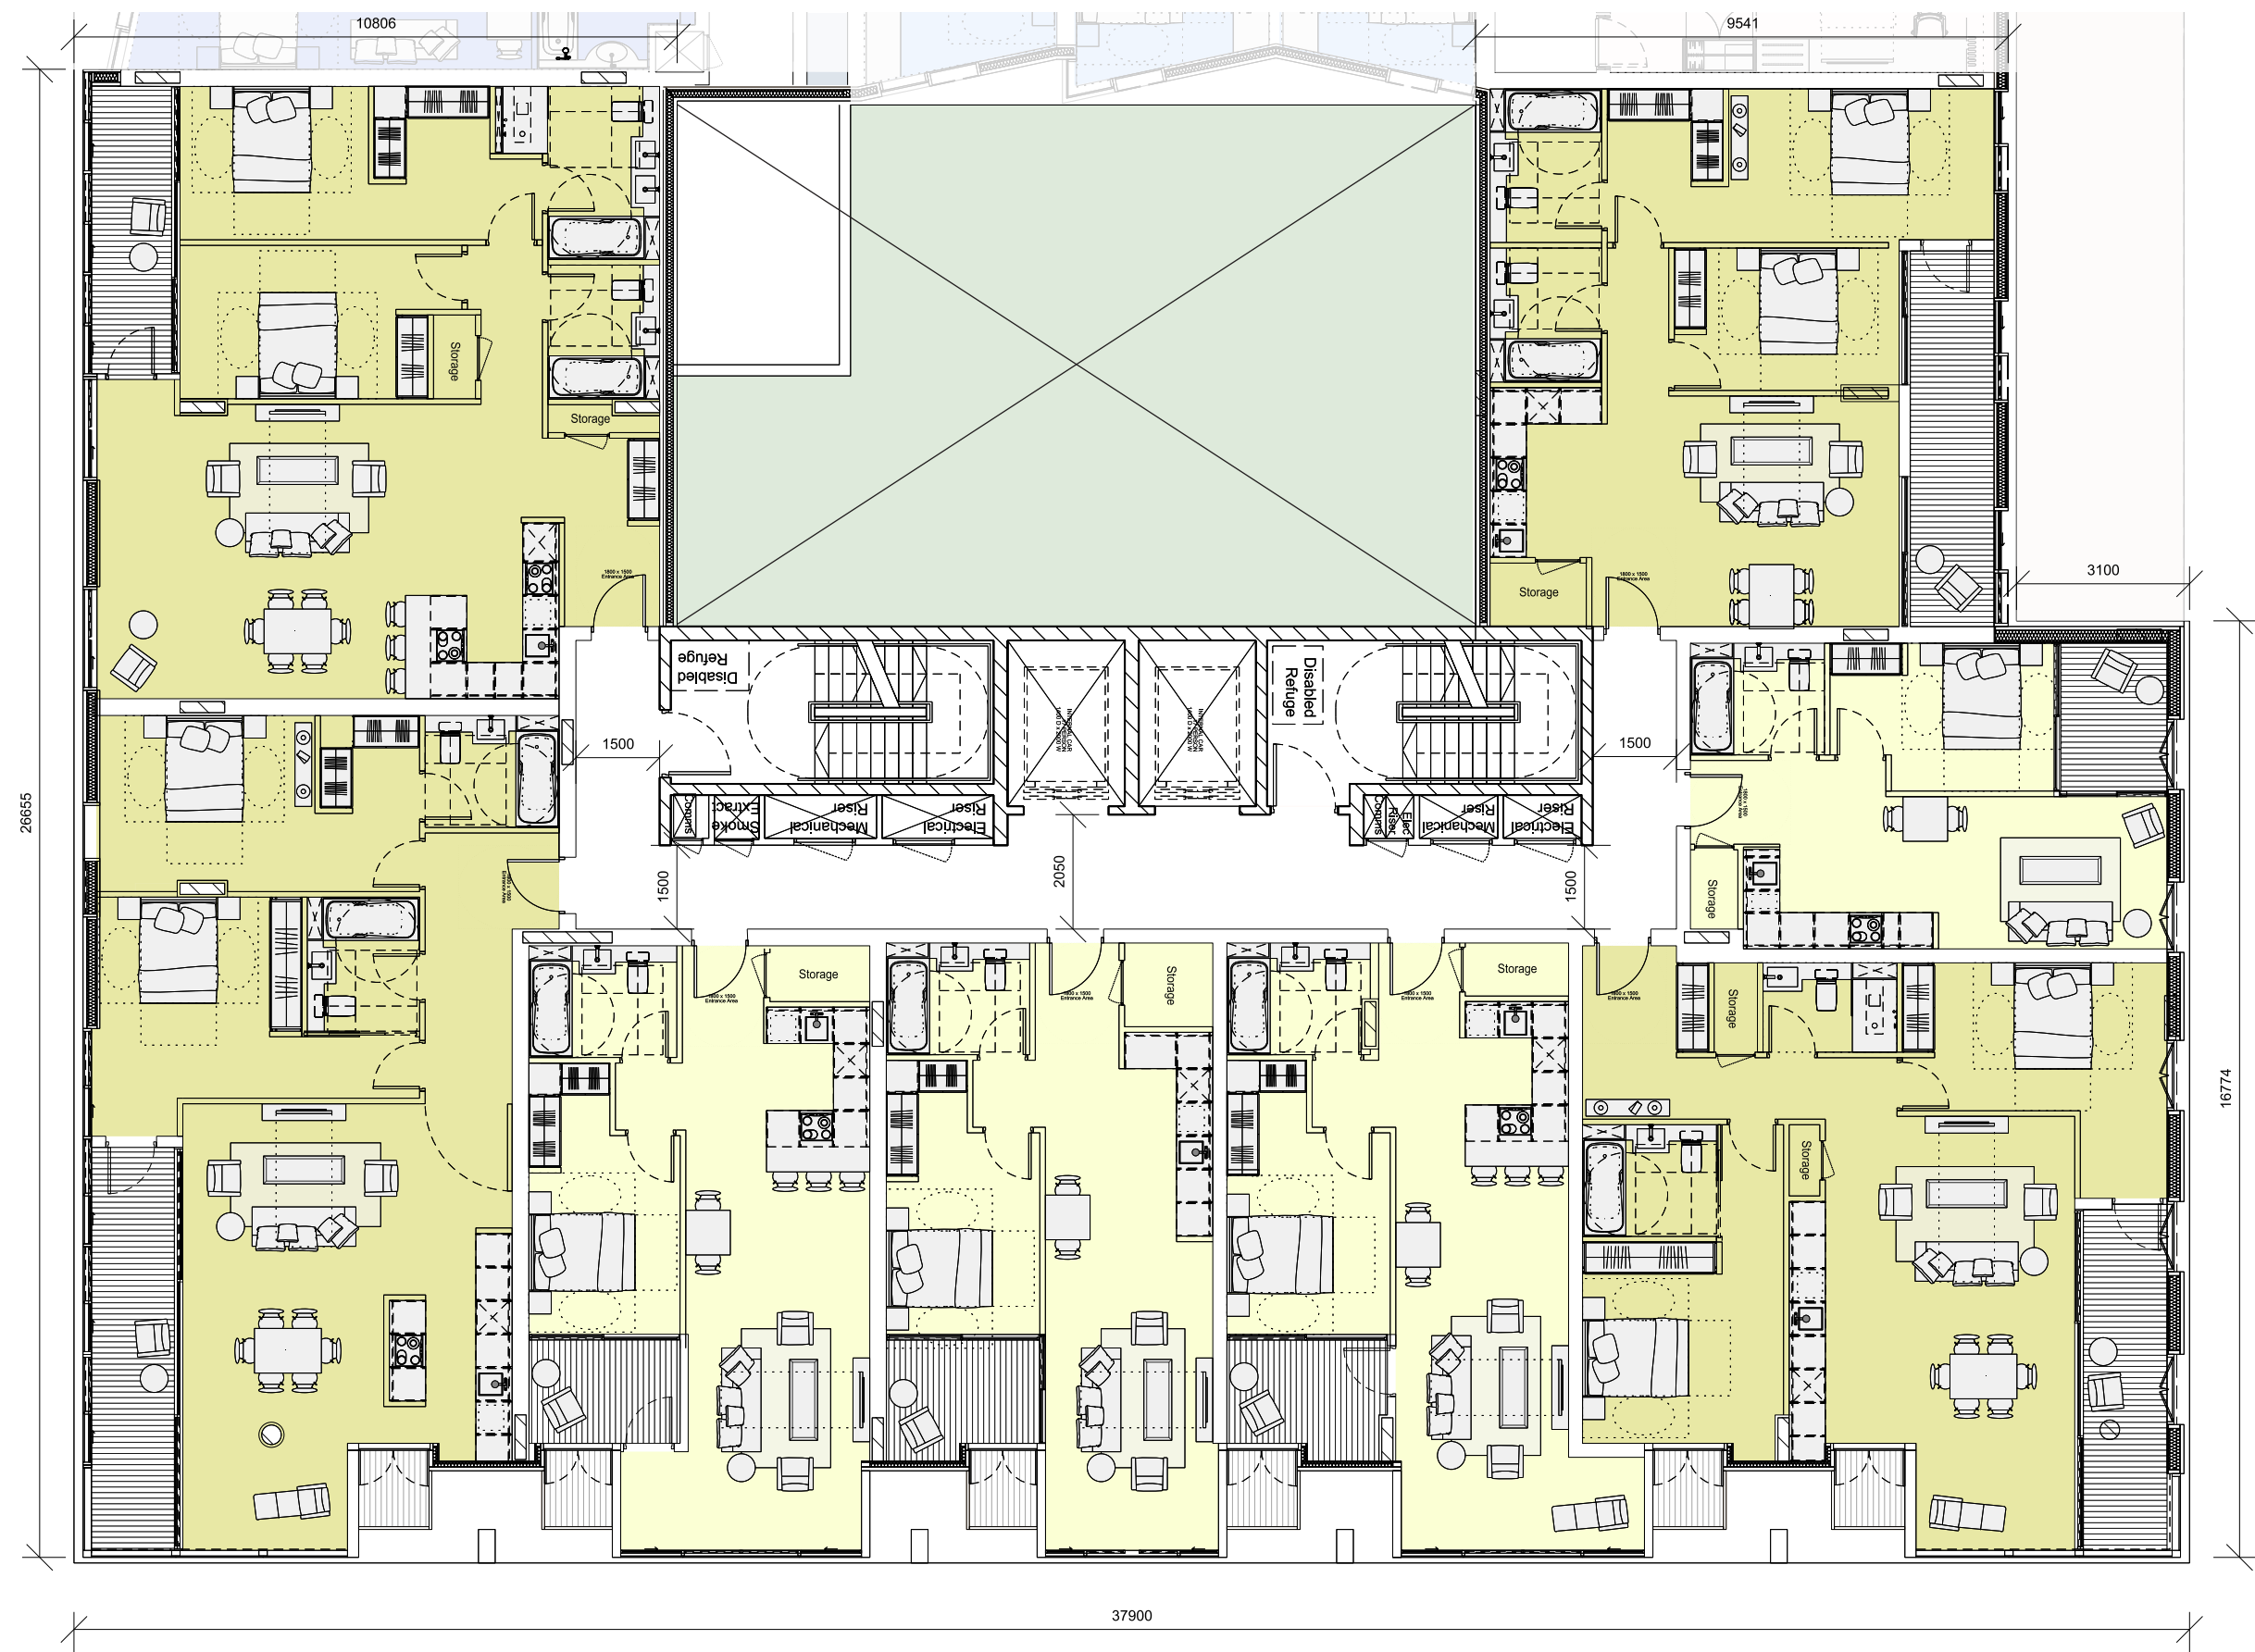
Typical plan for levels 4, 5 & 6 of the residential component of the building
